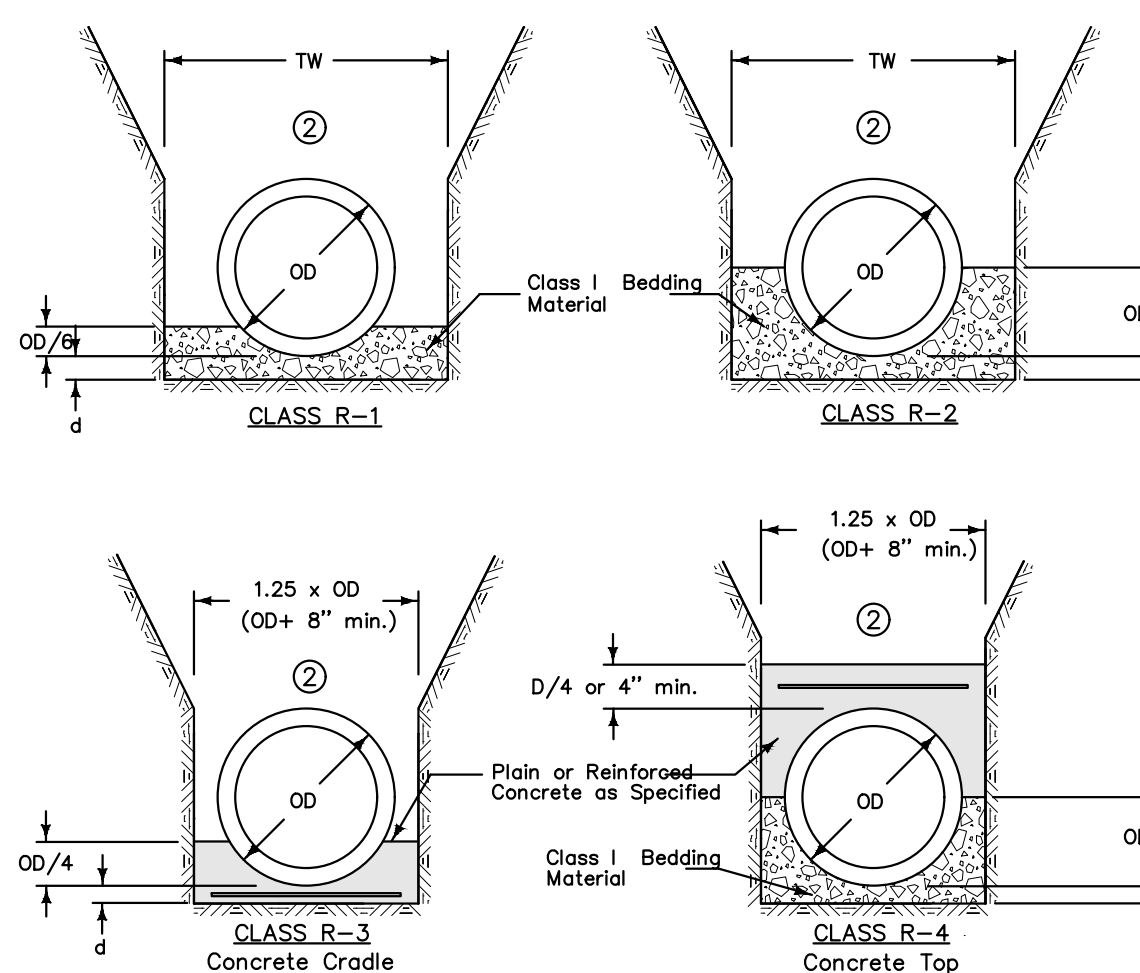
STANDARD ROAD PLAN	REVISION	NEW	04-18-17
